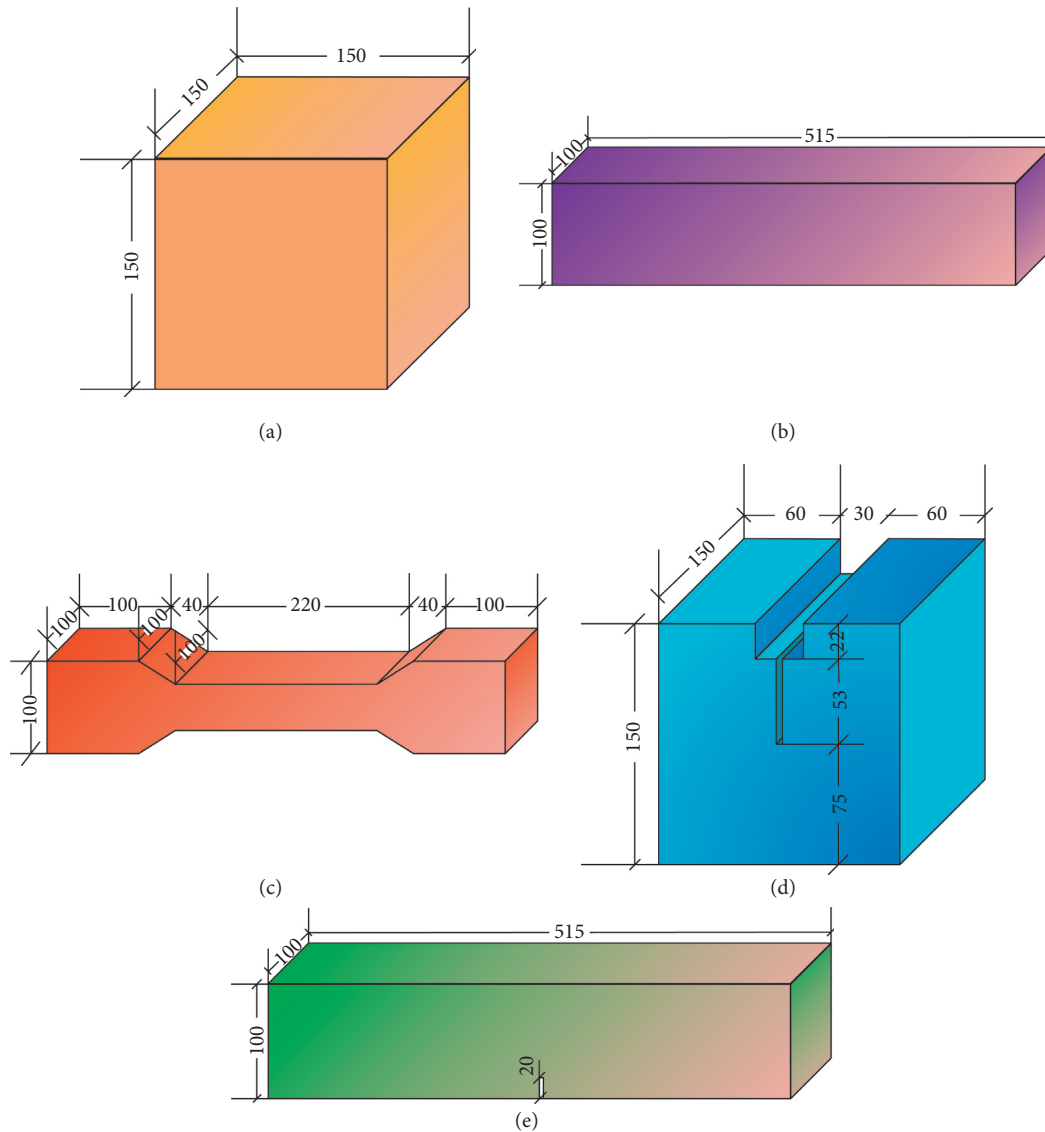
Shapes and sizes of specimens in different tests in millimetres: (a) compressive strength test specimen; (b) flexural strength test specimen; (c) uniaxial tensile test specimen; (d) wedged split tensile test specimen; (e) bending test specimen.
